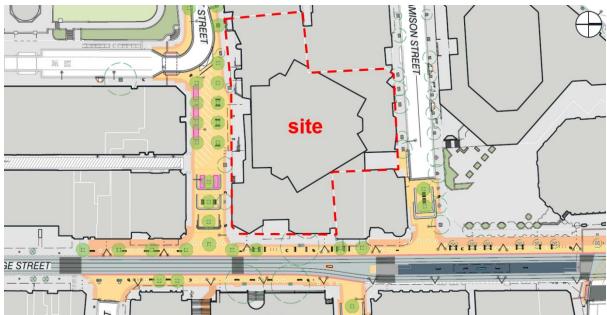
Planned public domain upgrades on Margaret Street, George Street, and Jamison Street
